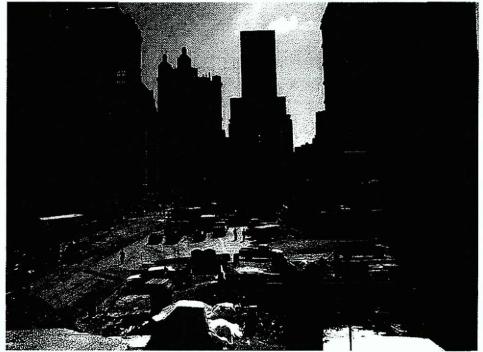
Area south of WTC Building 4, looking west. West Street in far background.
